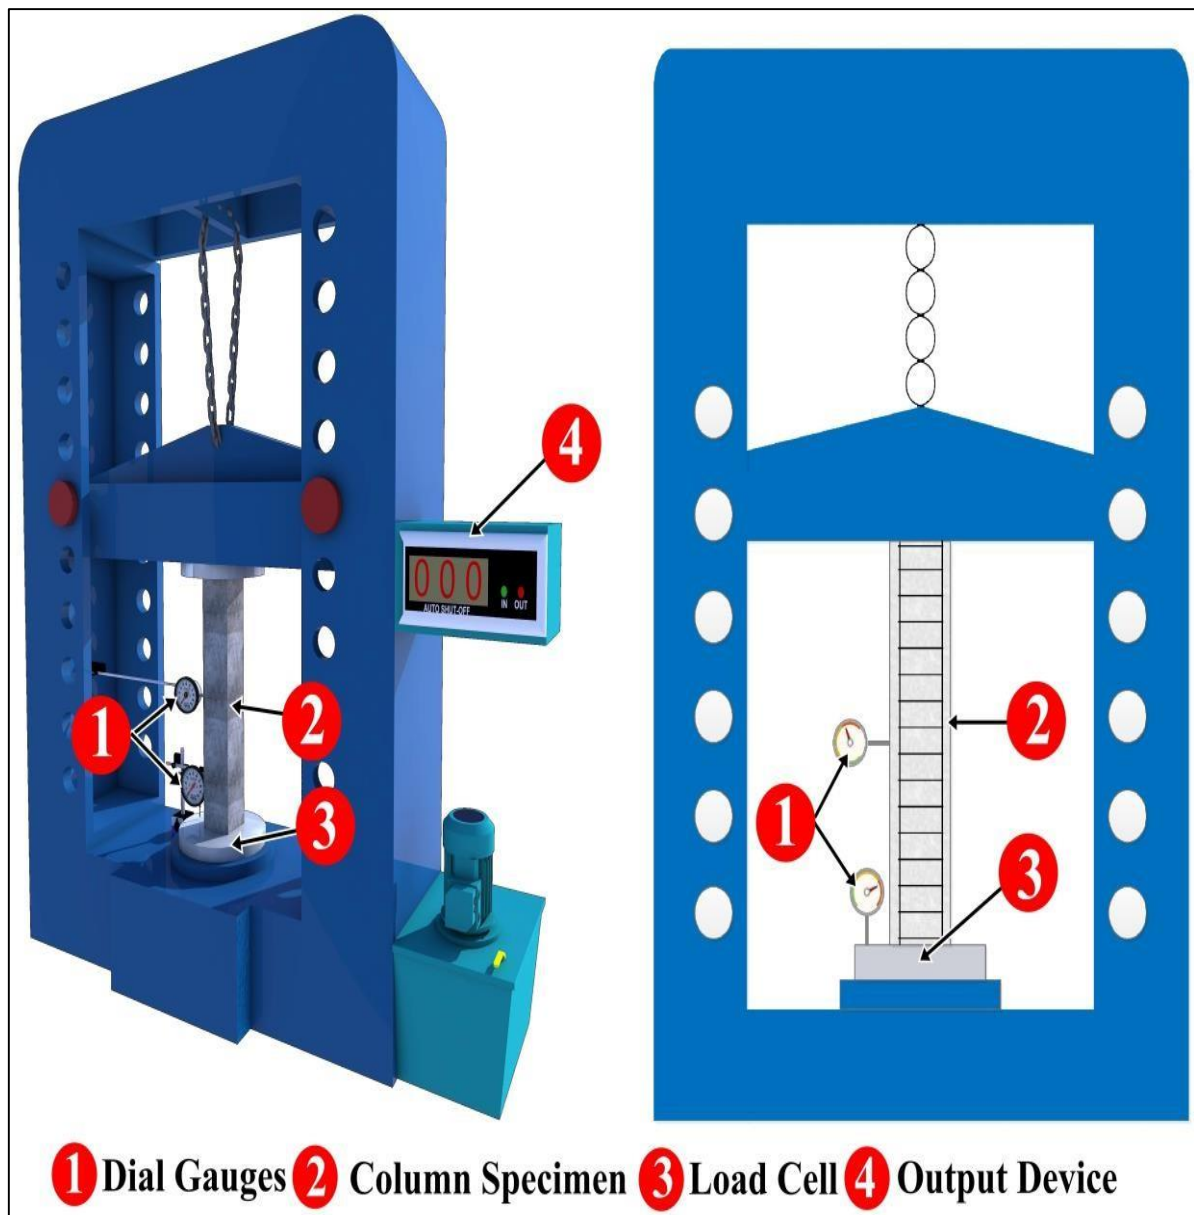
Electrohydraulic Machine for Columns Testing.
